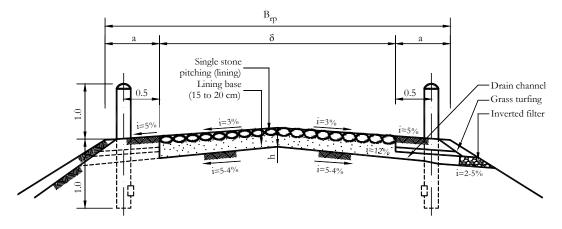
Arrangement of road at dam crest (Nayak, 1993)
